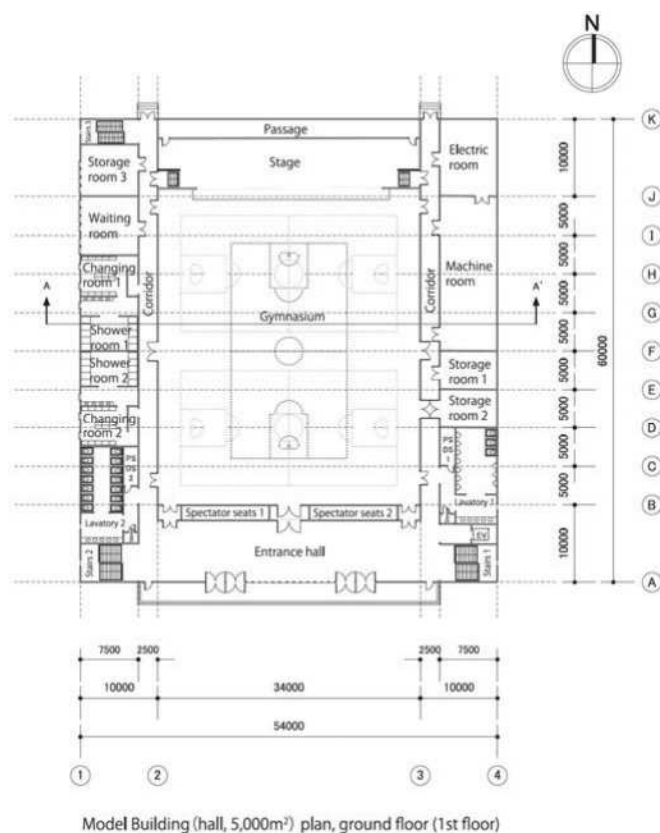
Model building (hall, 5 000 m²) plan, ground floor (first floor)
